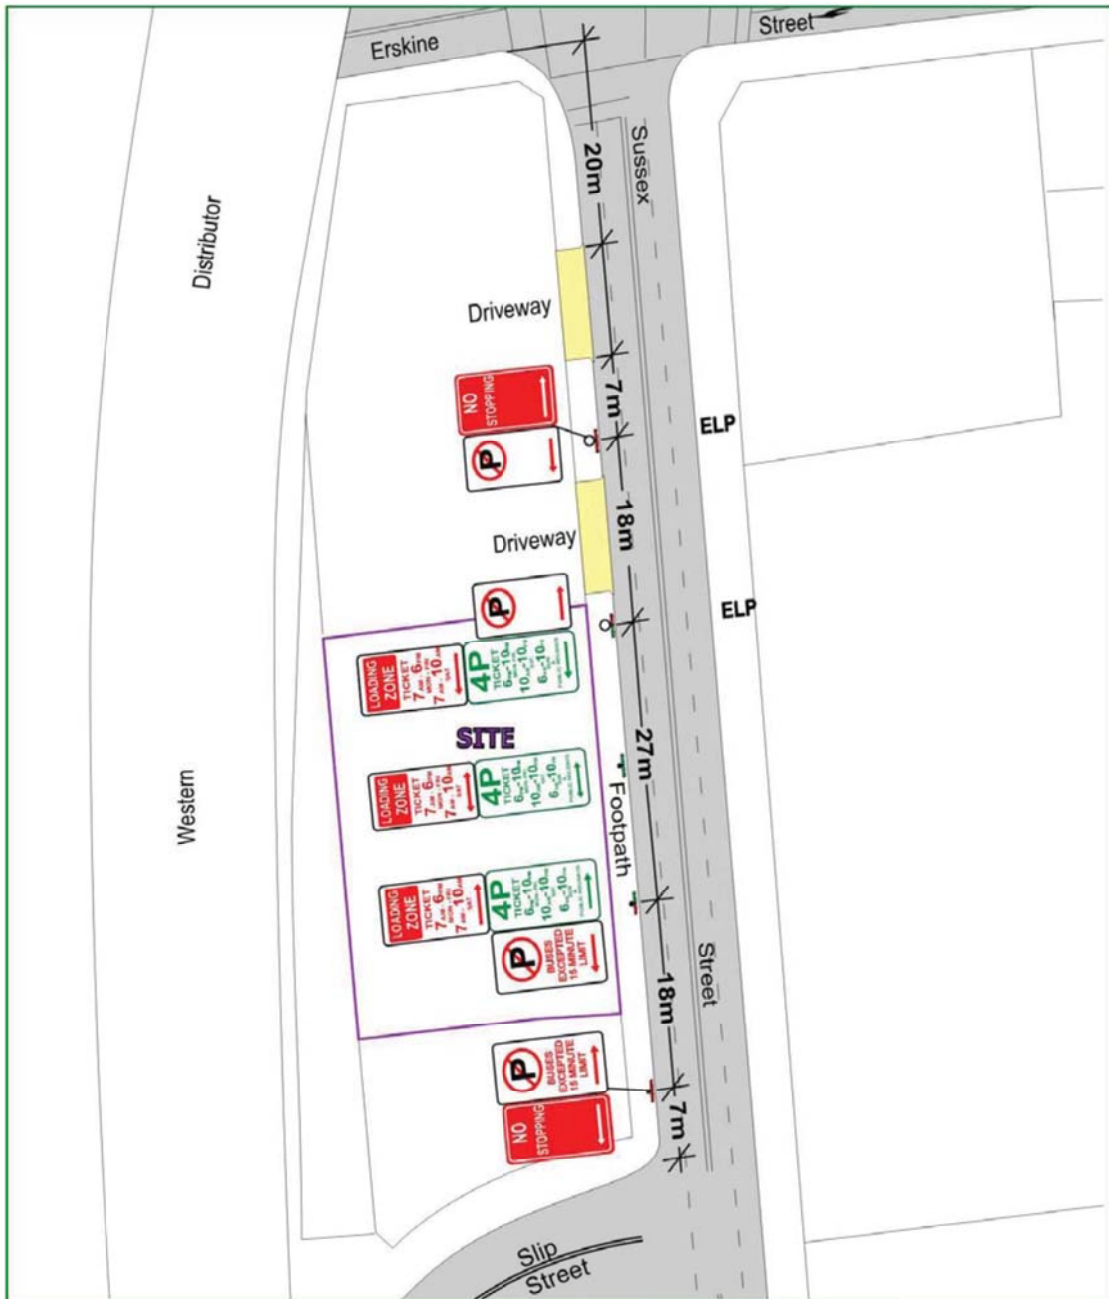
Proposed On-Street Loading & Parking Conditions along the Site Frontage
